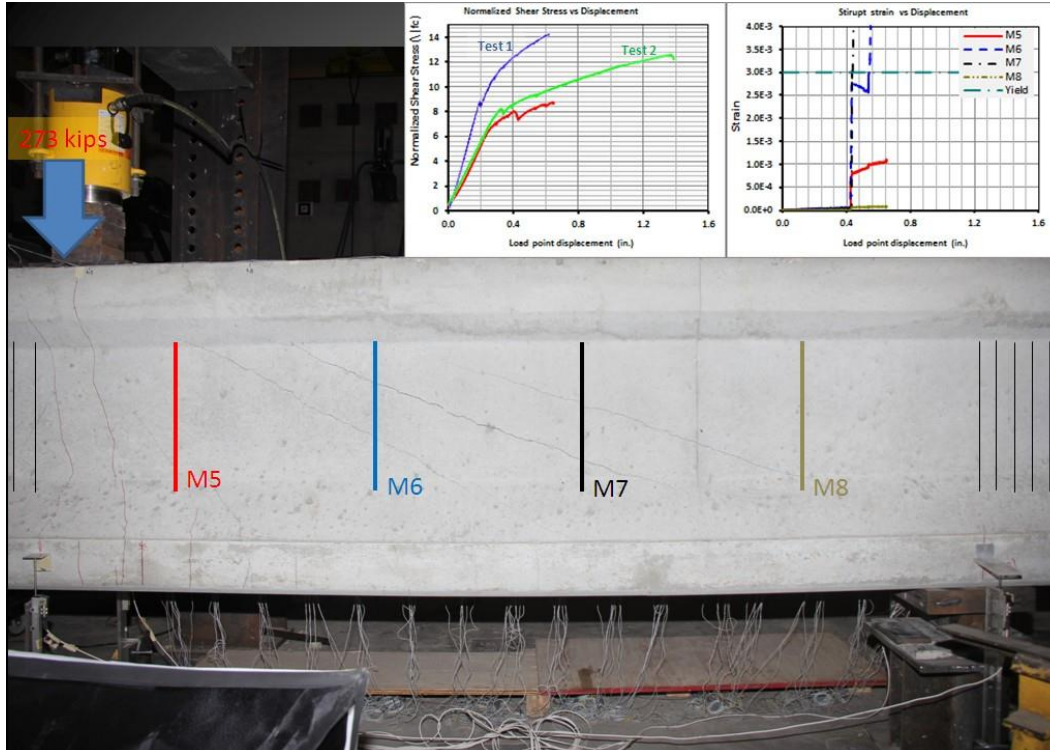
Girder 2-Test 3 peak load prior to failure
